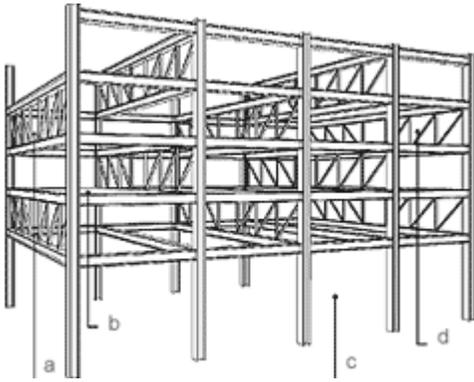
Here is an example rendering of a staggered truss system from a Case Study of Baruch College. This gives a 3-D view of the framing members that will be used.
